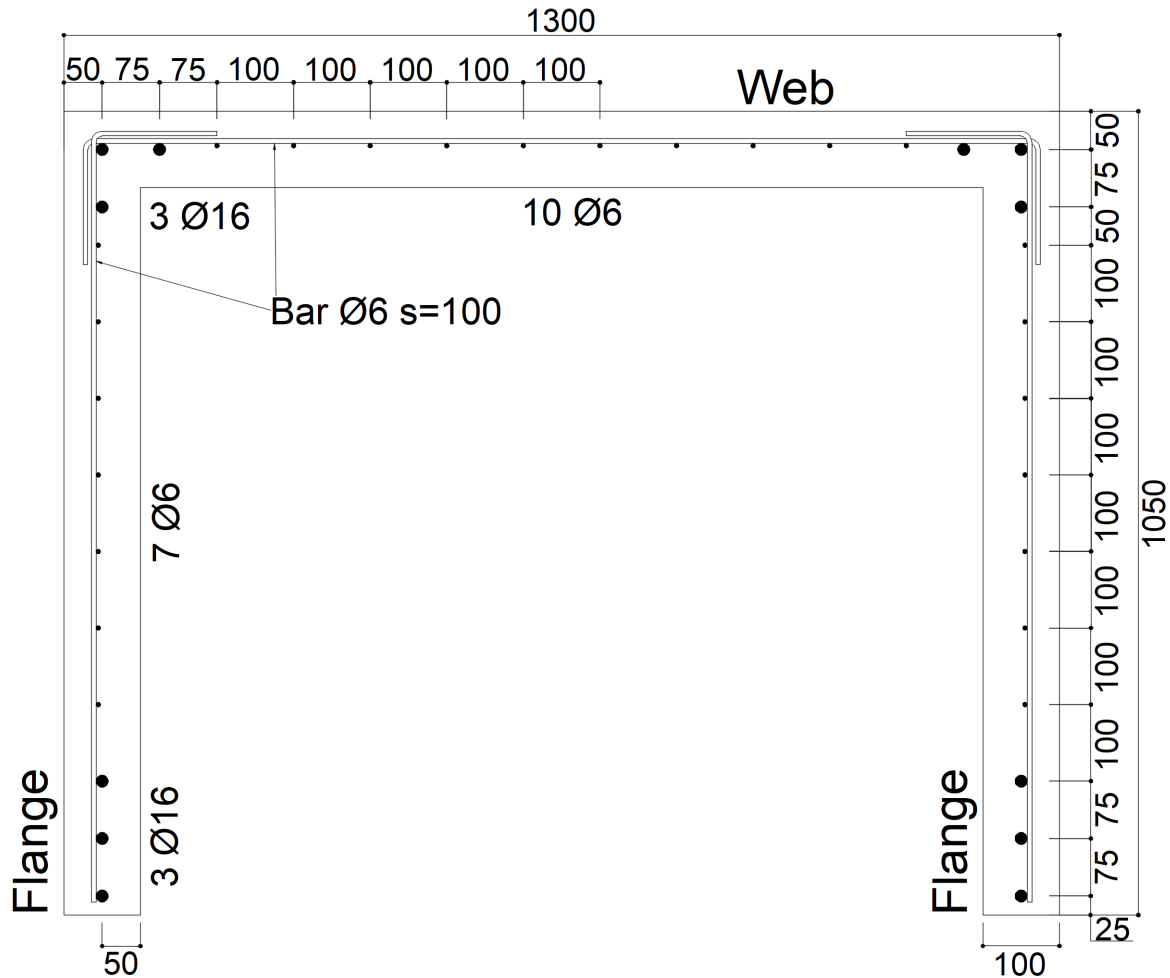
TUE: Cross section and reinforcement detailing [Unit: mm].
